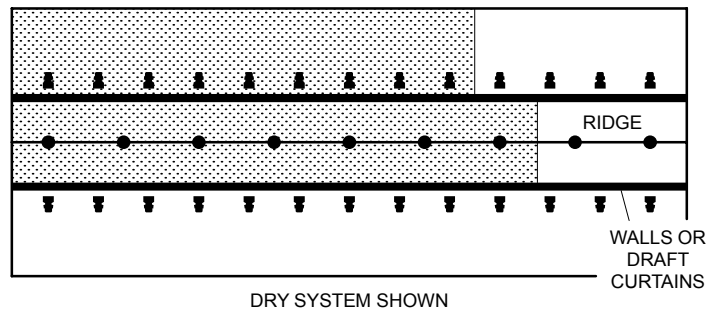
B-2. BB or SD Sprinklers & AP Sprinklers At The Eaves or Beyond An Obstruction
